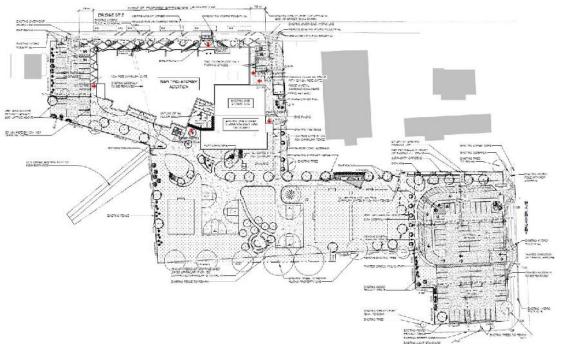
Proposed additions and renovations to St. Joseph Catholic School
